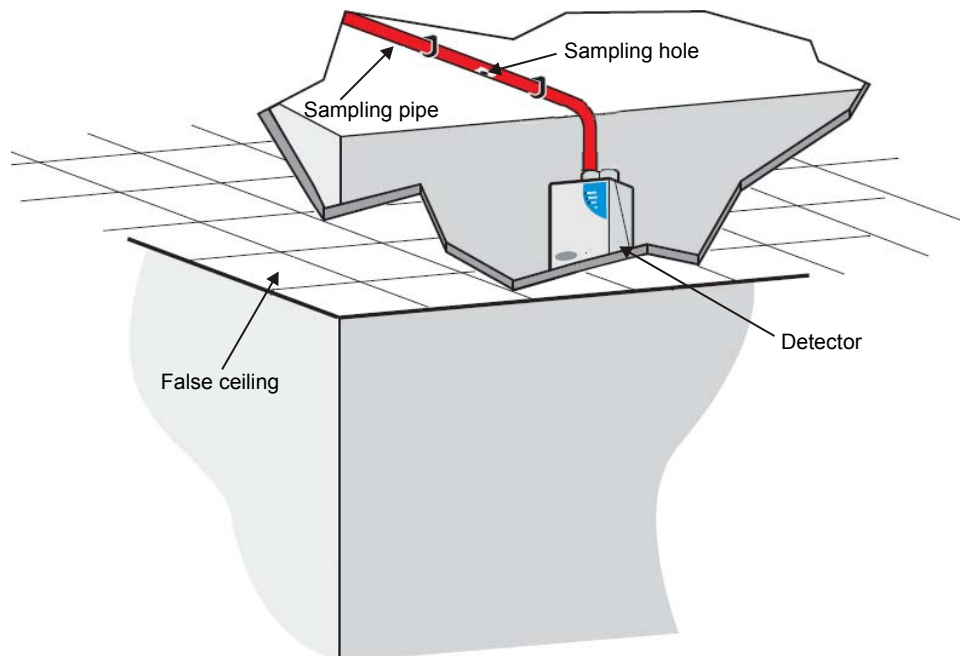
Installation with detector mounted in ceiling void (no exhaust piping)
